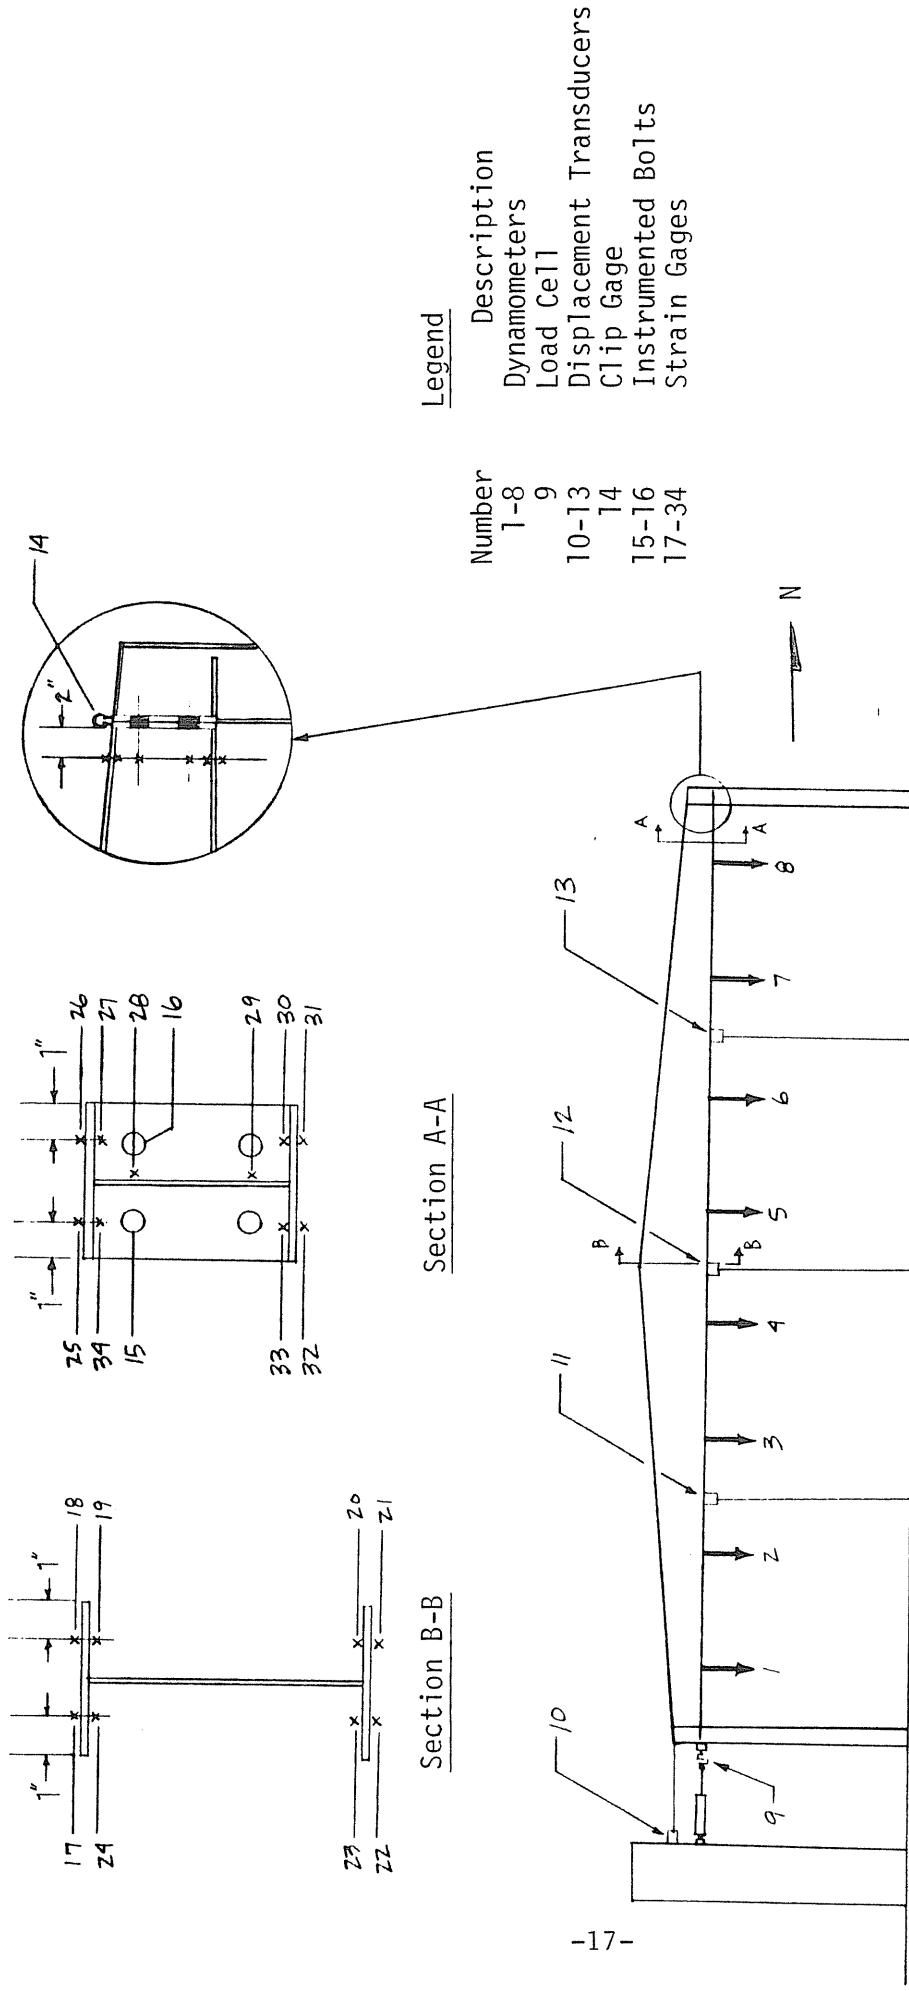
VIEW OF EAST FRAME INSTRUMENTATION
